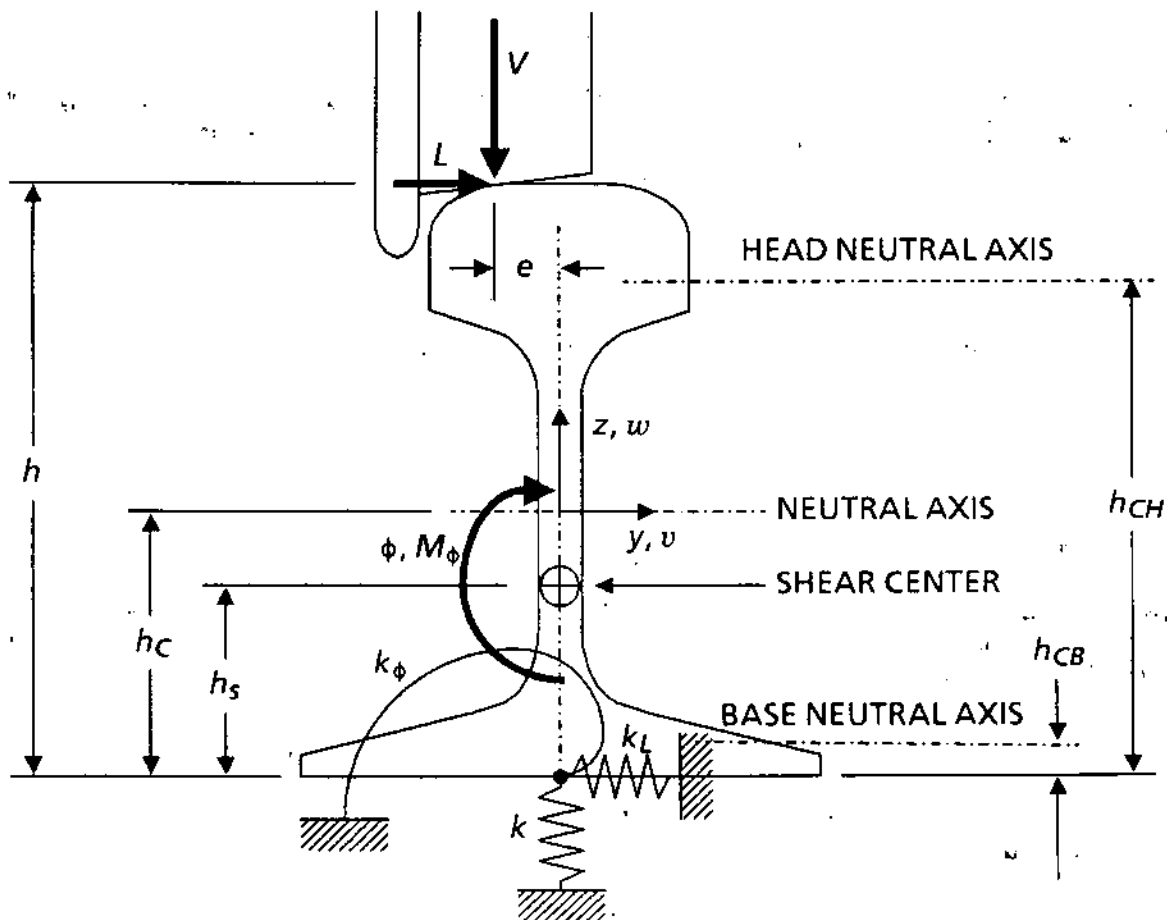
RAIL AS A BEAM ON A CONTINUOUS ELASTIC FOUNDATION.
